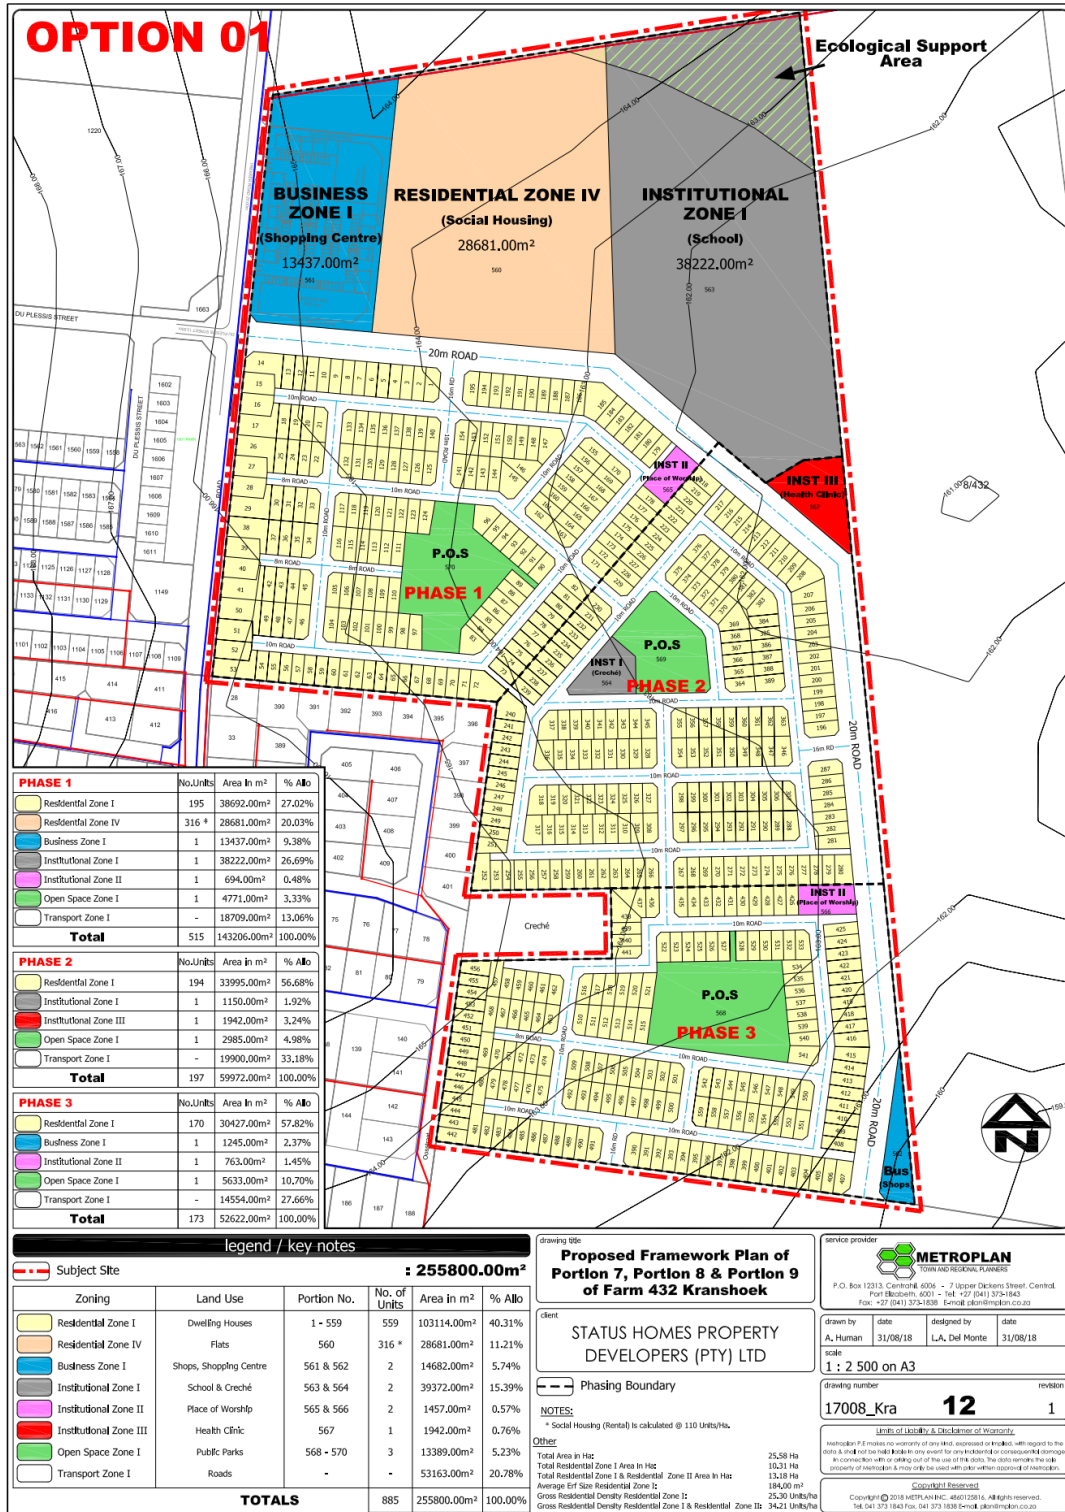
Original Conceptual Site Layout Plan (Alternative A: Option 1) as per Appendix C2.
